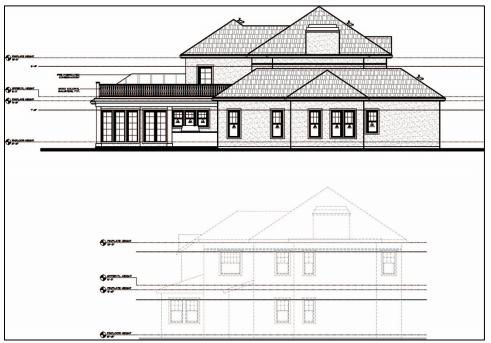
East elevation showing existing facade (bottom) and proposed modifications, including new east wing, lanai, and conservatory (top).
